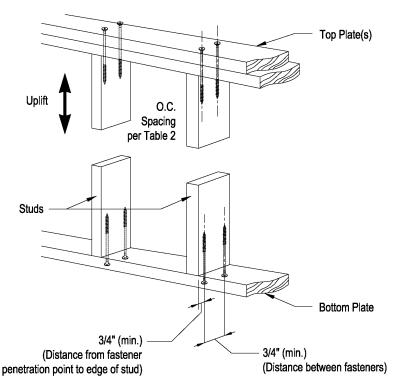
Installation Of Two (2) HeadLOK® Into Double Top Plate & Single Bottom Plate (Note: Similar installation would be used for a single top plate and/or a double bottom plate.)
